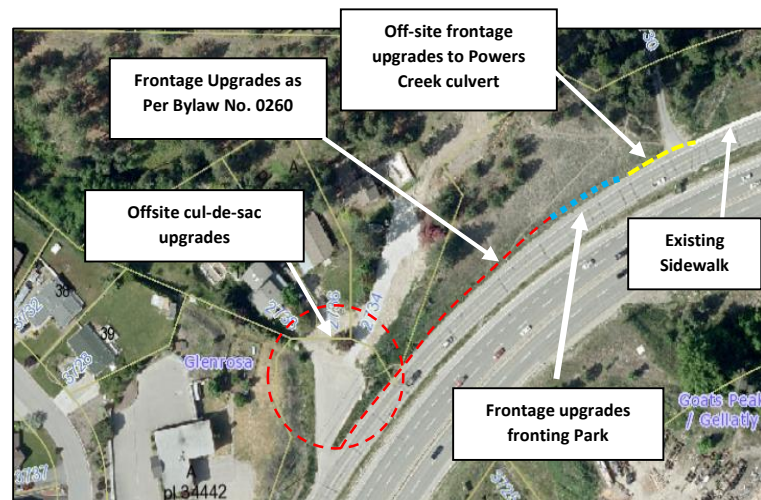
Cul-de-Sac and Proposed Sidewalk Extension Lower Glenrosa
